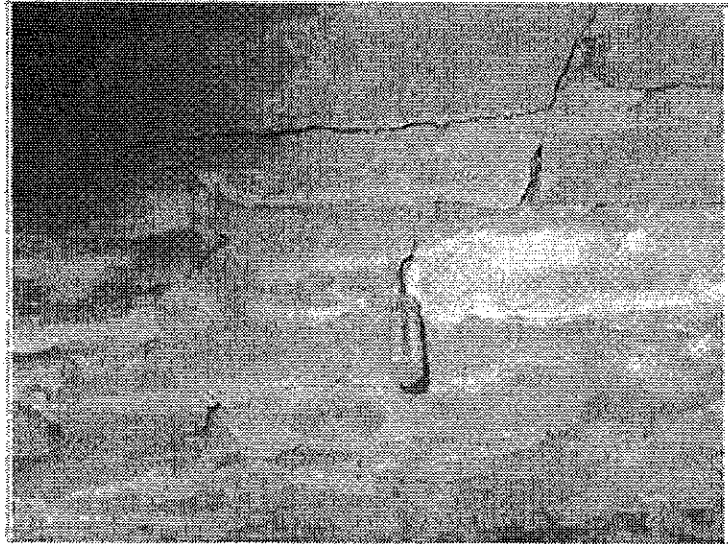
North wall of original basement (inside north addition)
